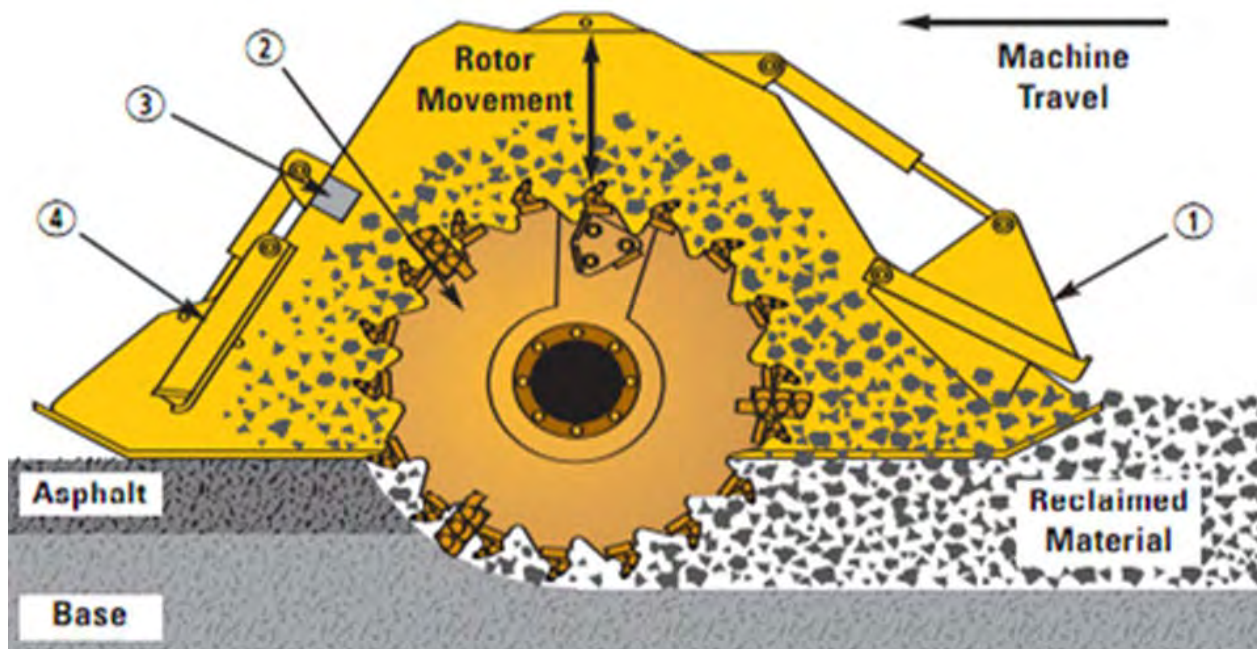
Operation of the reclaimer used to blend the underlying, existing surface with RAP or CTB on Sweetwater County’s Crooks Gap Road. (1) Adjustable rear door. (2) Universal rotor. (3) Breaker bars. (4) Adjustable front door.
